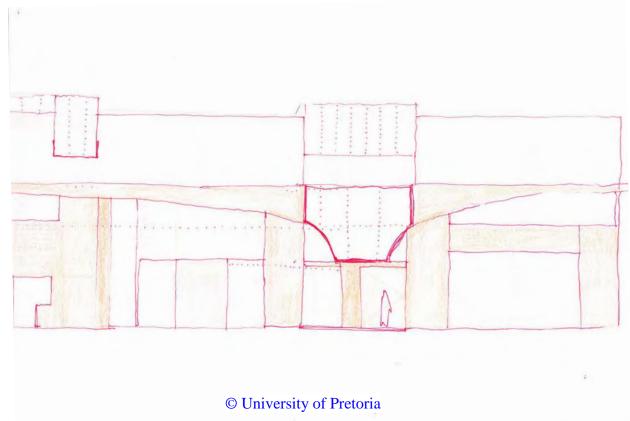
Conceptual elevations for the building north and south. Gold represented plastic construction, blue is that of aperture or transparency, red is brickwork and black concrete.
